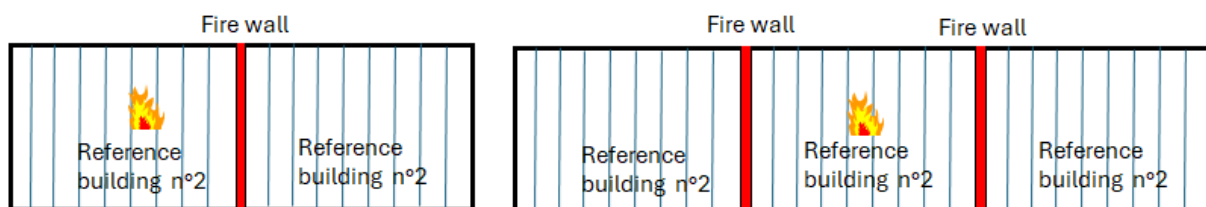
Studied building configurations - Fire wall parallel to steel portal frames
